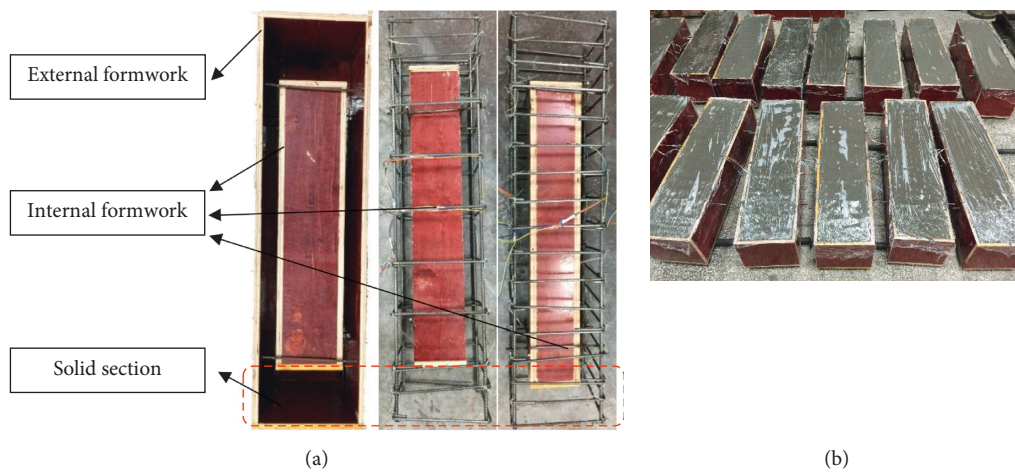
Specimen details. (a) Formwork creation and installation. (b) UHPFRC casting.
